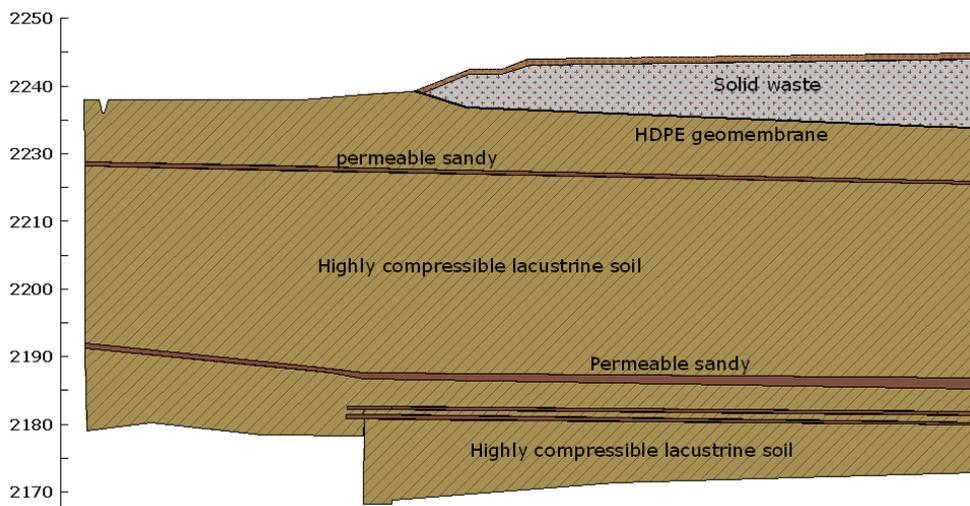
Soil strata in the subsoil of the Bordo Poniente Landfill.
